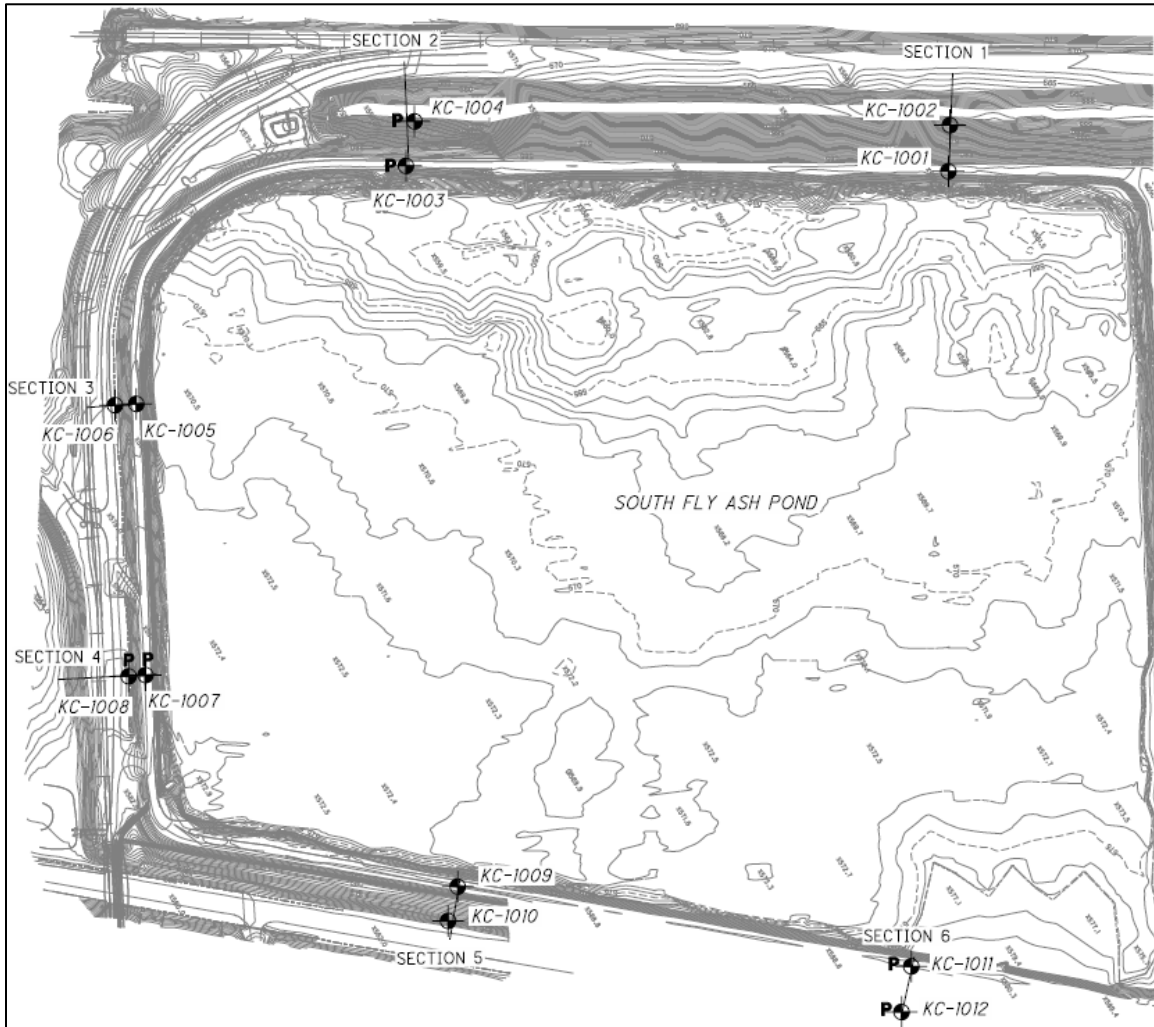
Kyger Creek Station South Fly Ash Pond – Plan View of Cross Sections (DLZ, 2015)
